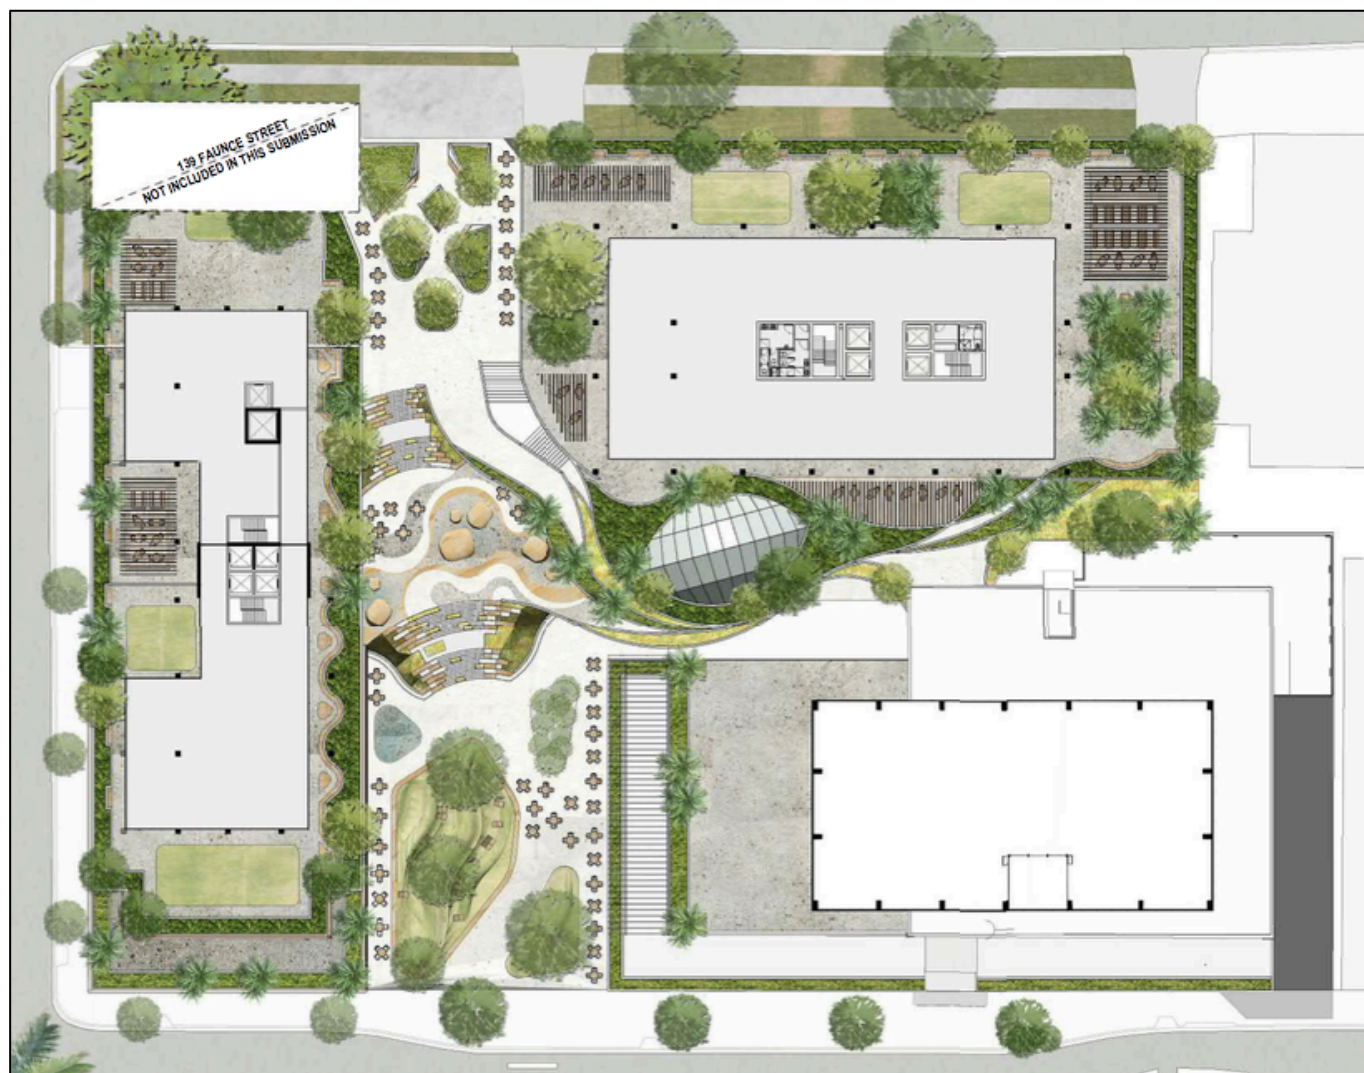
Concept Landscape Masterplan (source: Contour Landscape Architecture)
